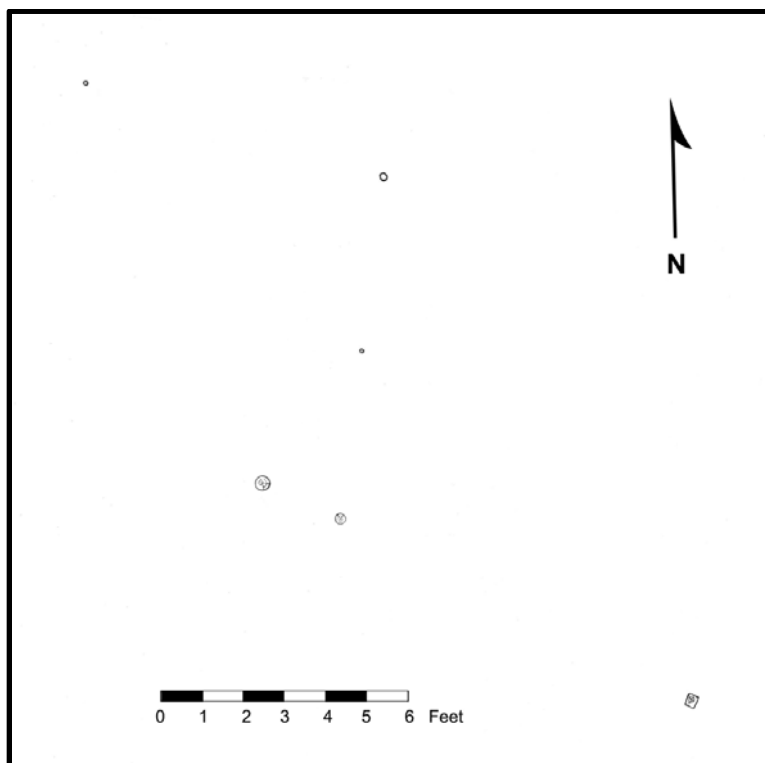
Plan drawing of A72 Pilings (Sarah L. Tichonuk, LCMM Collection).
